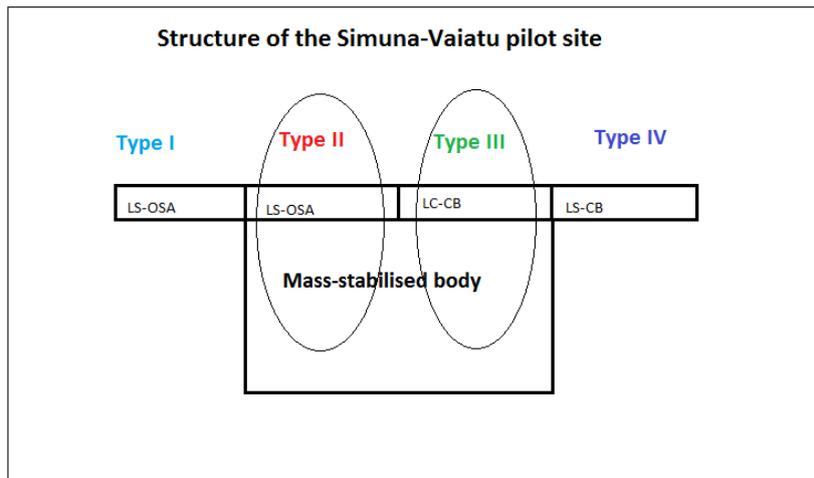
Simuna-Vaiatu pilot site construction scheme.
